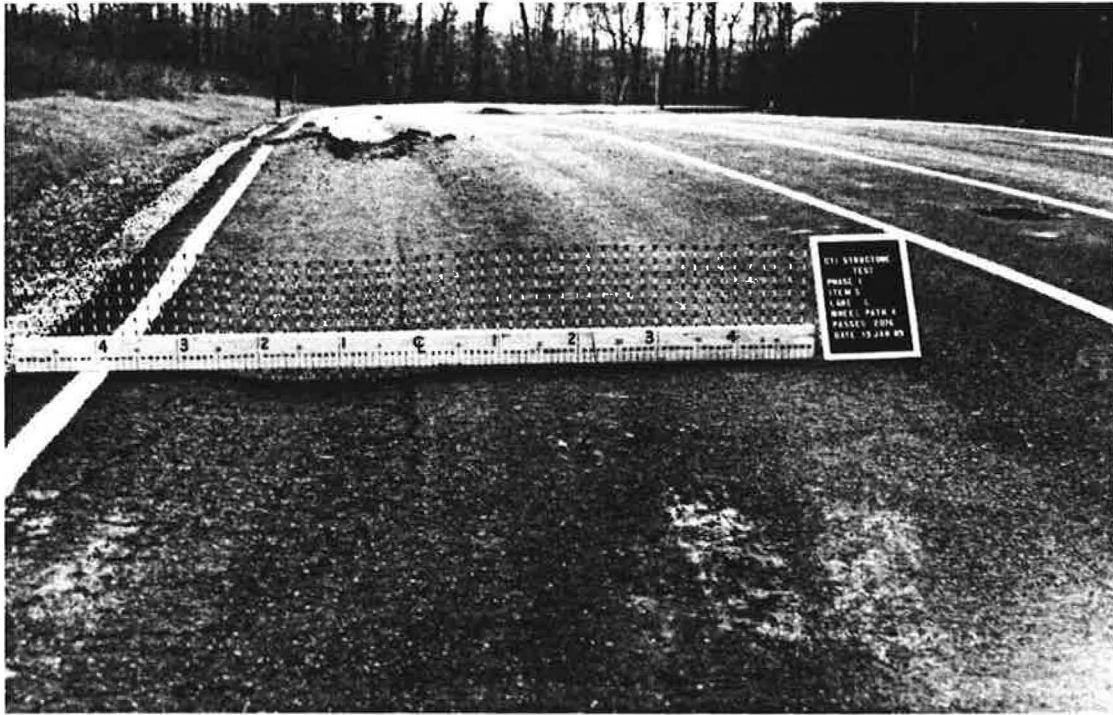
Low-pressure lane, Section 5, failure after 2,076 passes.
